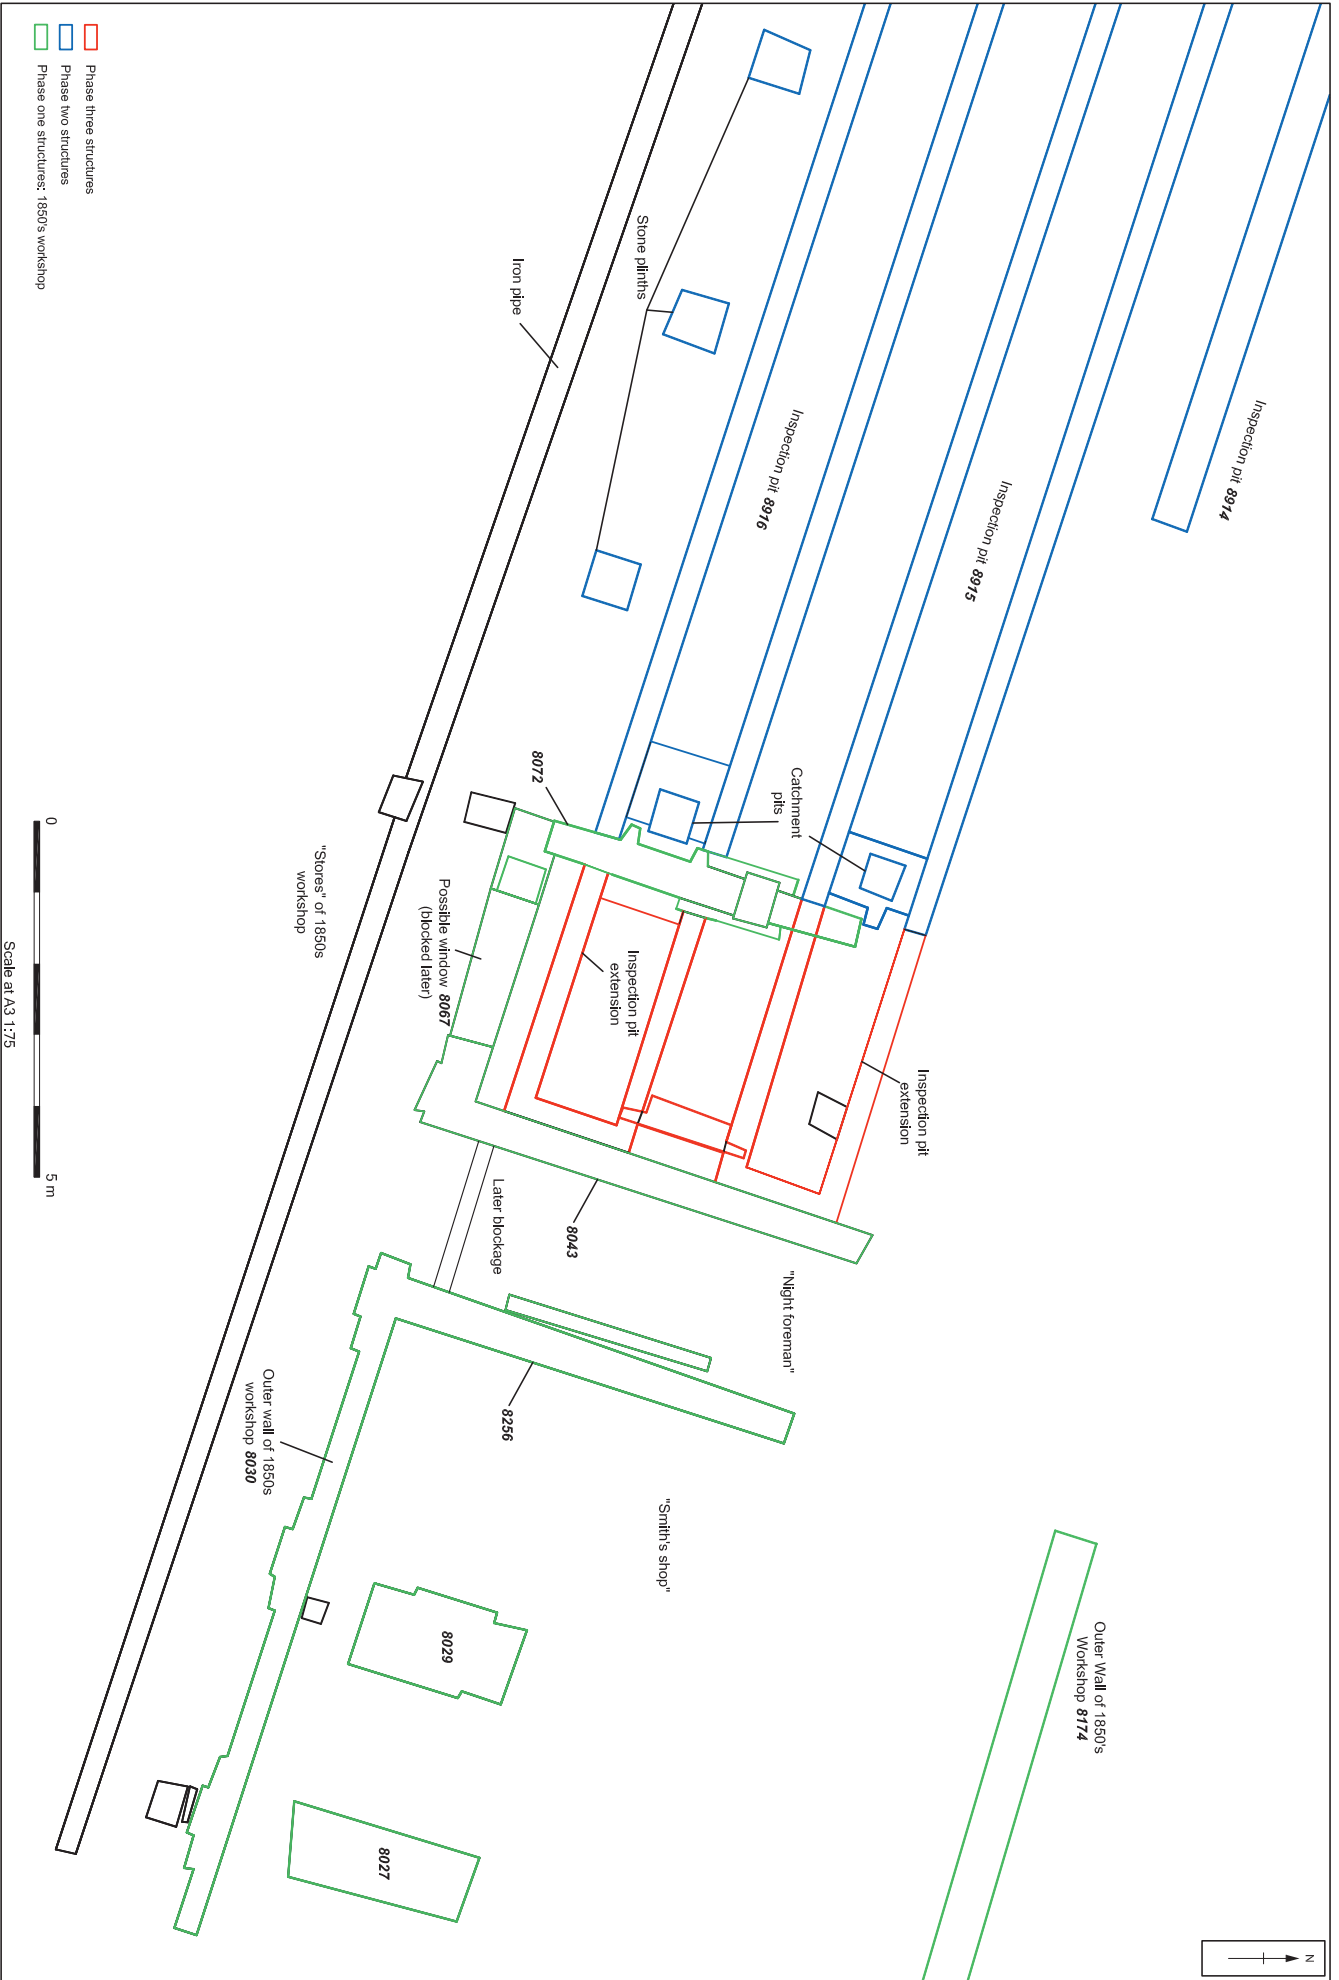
Plan of Middle Section of Broad Gauge Engine Shed - Structure 1
